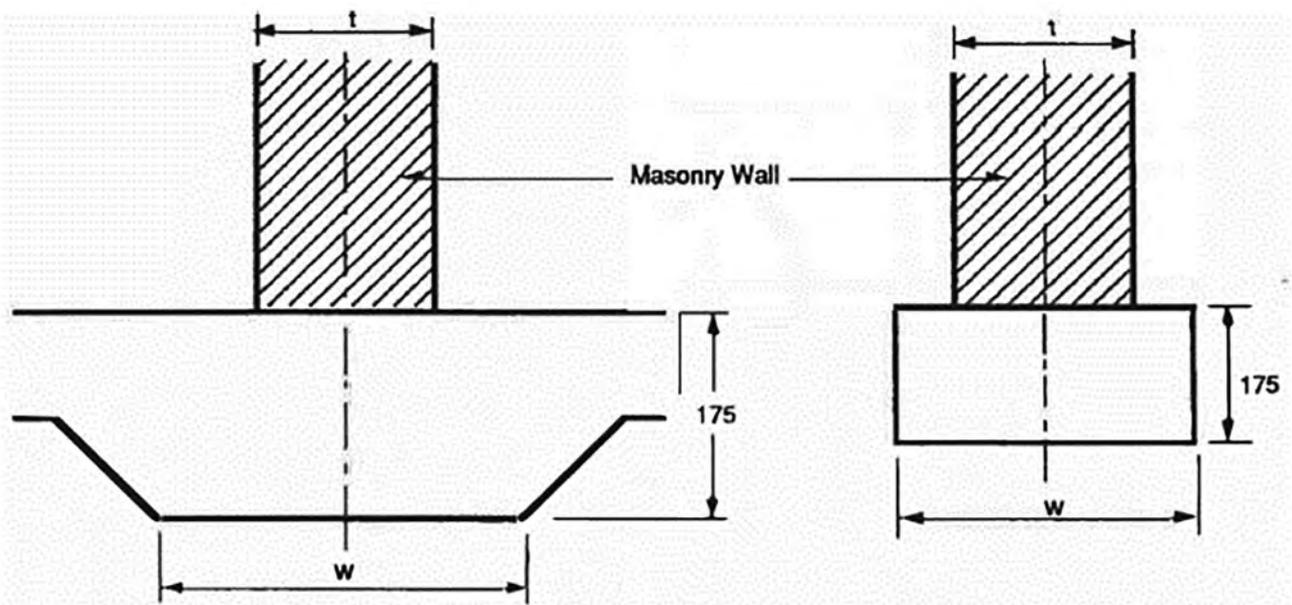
REINFORCED CONCRETE FOOTINGS
